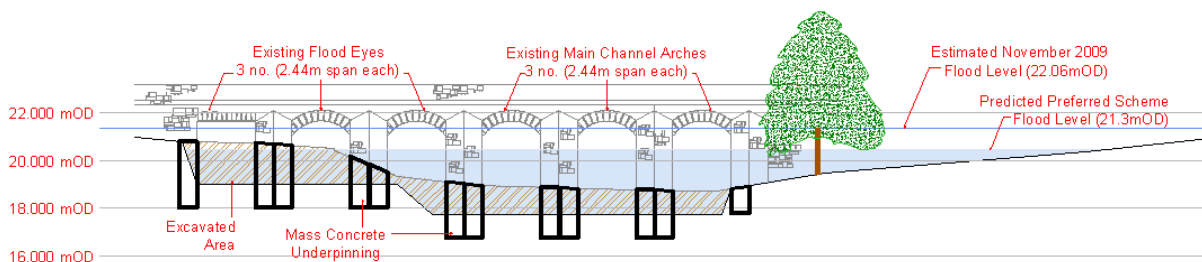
Proposed Works at the Old Pedestrian Bridge in Craughwell
